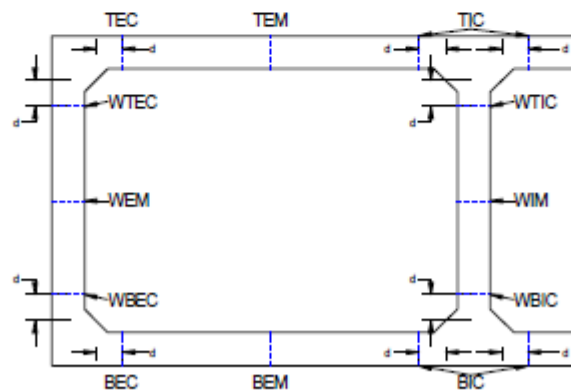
B SHEAR CRITICAL SECTIONS FOR CULVERTS WITH HAUNCHES.
